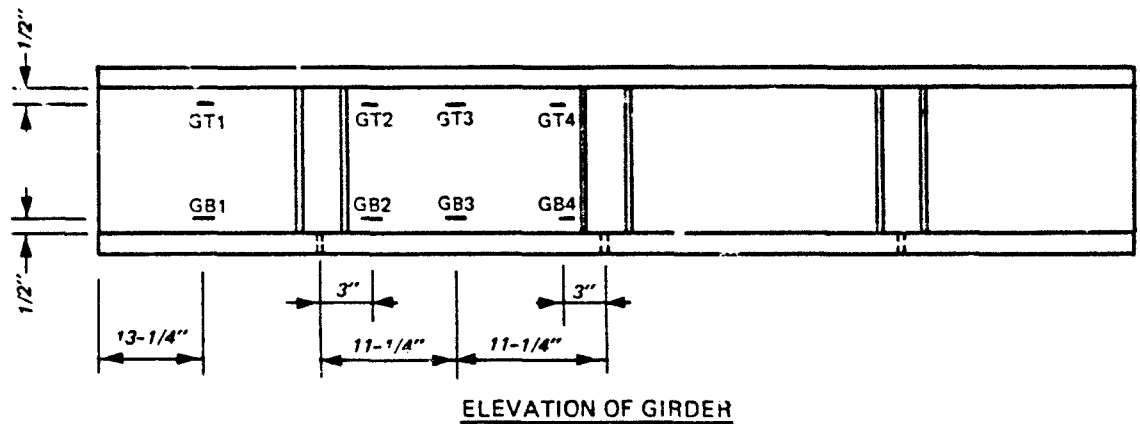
Roof girder strain gage locations for Tests D1 and S1.
